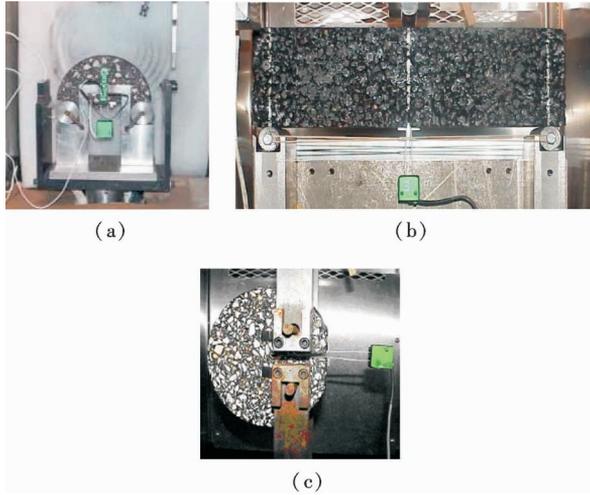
Primary fracture tests for asphalt mixture. (a) SC(B) test; (b) SE(B) test; (c) DC(T) test
